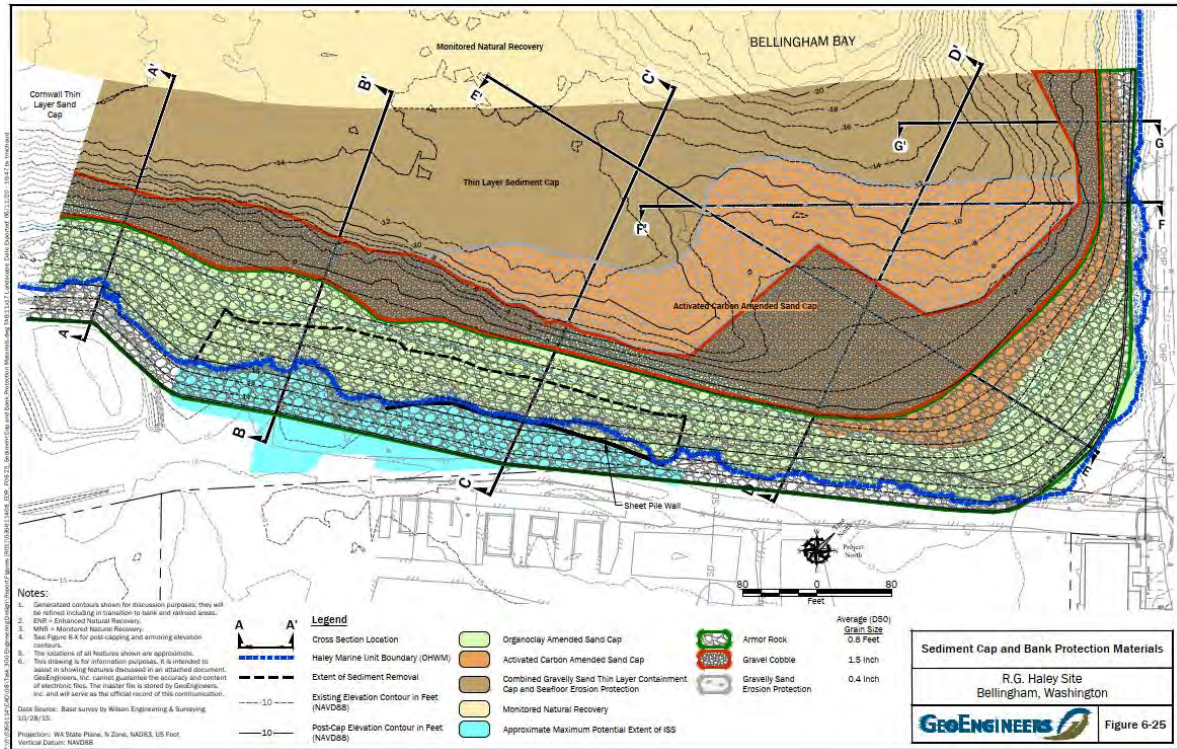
Plan view of recommended design shoreline and bottom slope erosion protection materials
